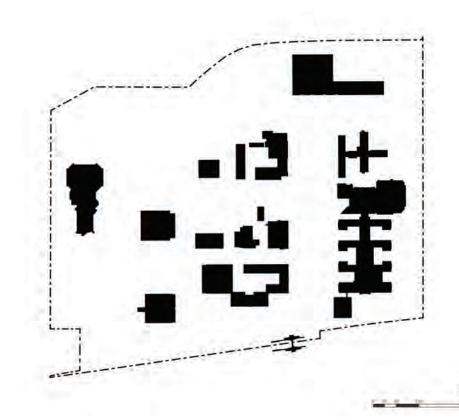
Existing Building Footprint Figure-Ground Plan
